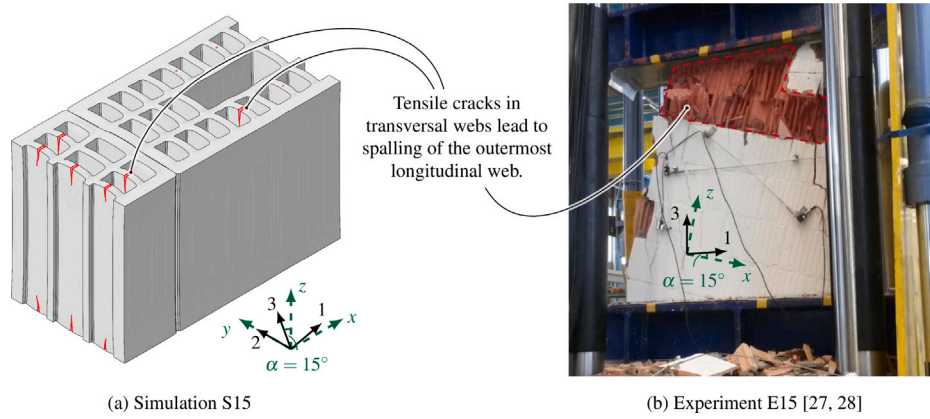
Failure mechanism I – Failure under vertical compressive loading was governed by tensile cracks in the transversal webs and subsequent spalling of the outermost longitudinal webs.
